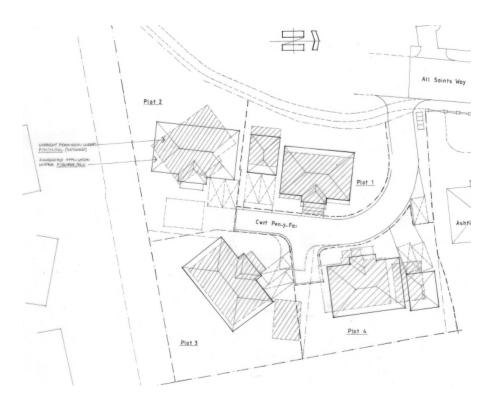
Proposed revised layout that consent is now sought – (hatched areas indicate siting of previously approved dwellings on the site)
